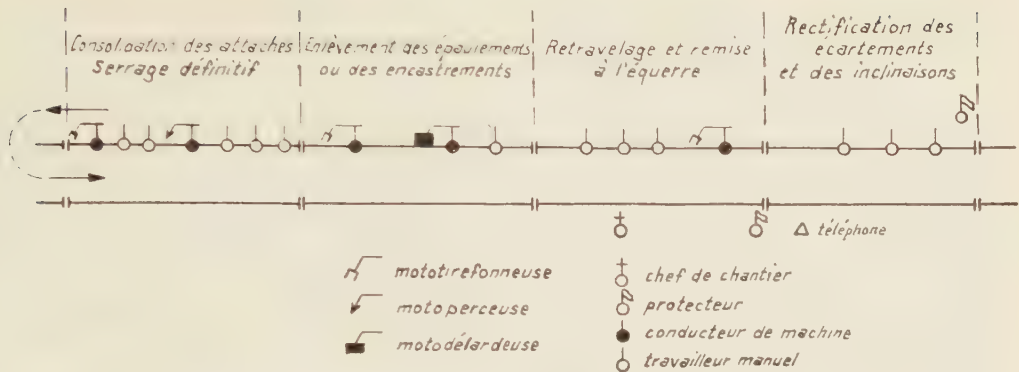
Average sized gang. Tightening up the fastenings, cutting and correcting the gauge — 20 men.
